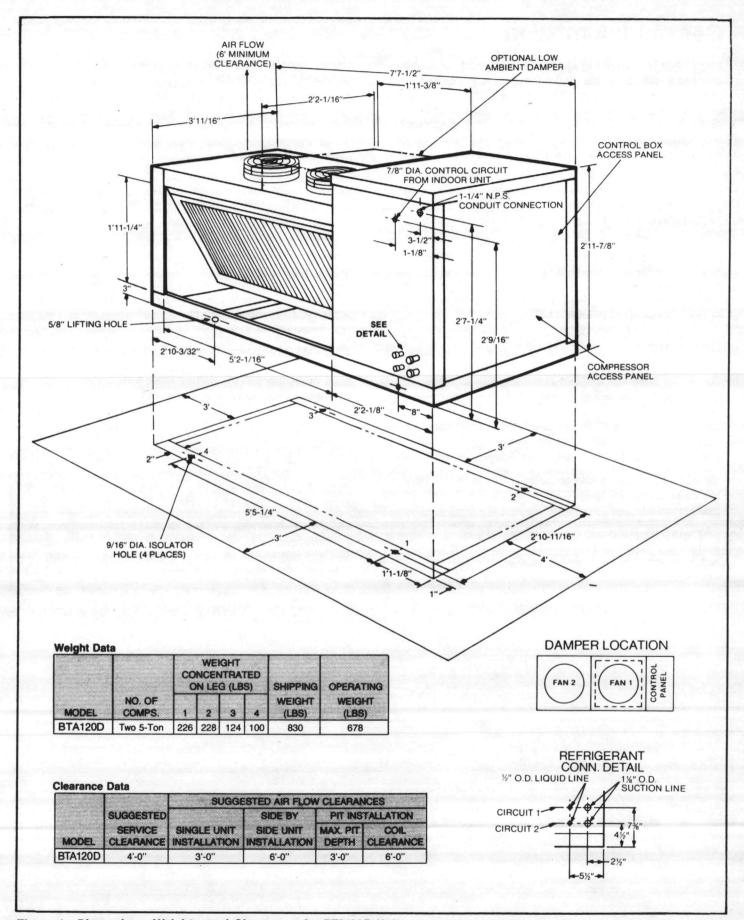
Dimensions, Weights, and Clearances for BTA120D Units
